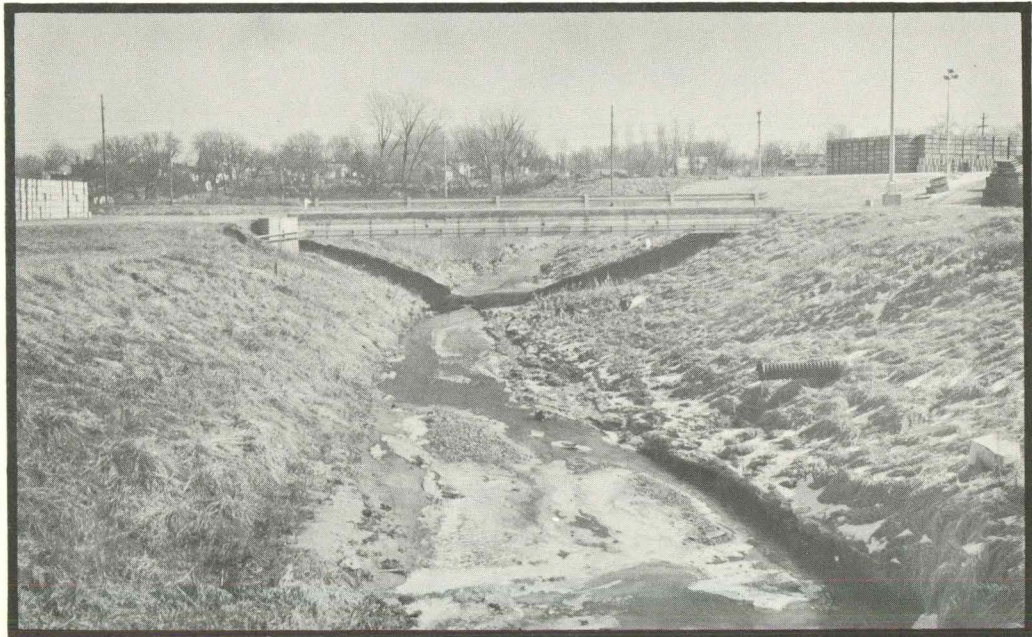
Service road bridge at the H. J. Heinz Company plant, looking downstream, Muscatine, Iowa.
